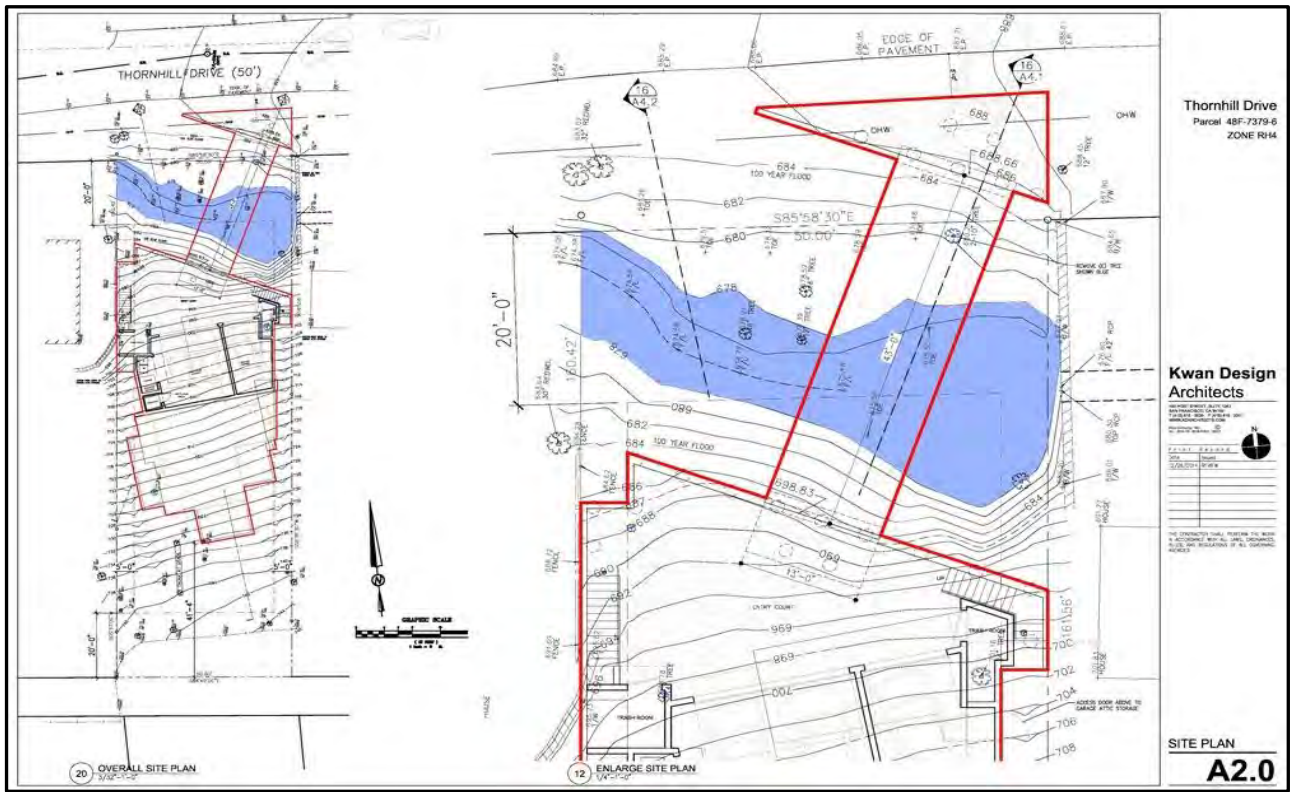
Proposed location of single-family home on lot 59, APN48F-7379-6 illustrating the footprint of the proposed structure and access bridge across Temescal Creek, elevation of the 100-yr flow, and trees to be removed (blue outline).
